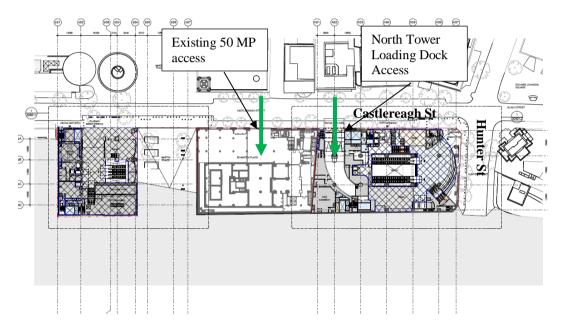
Access points to North Tower Loading Dock and 50 Martin Place
